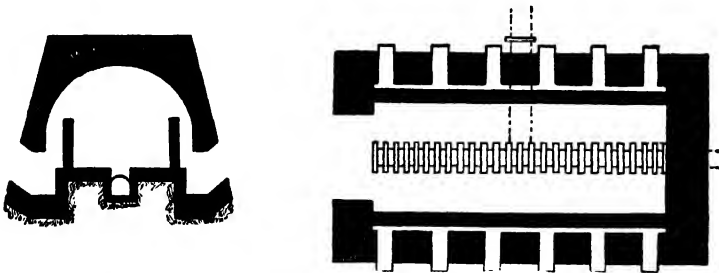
Cross Section and Plan of Down-Draught Kiln.
